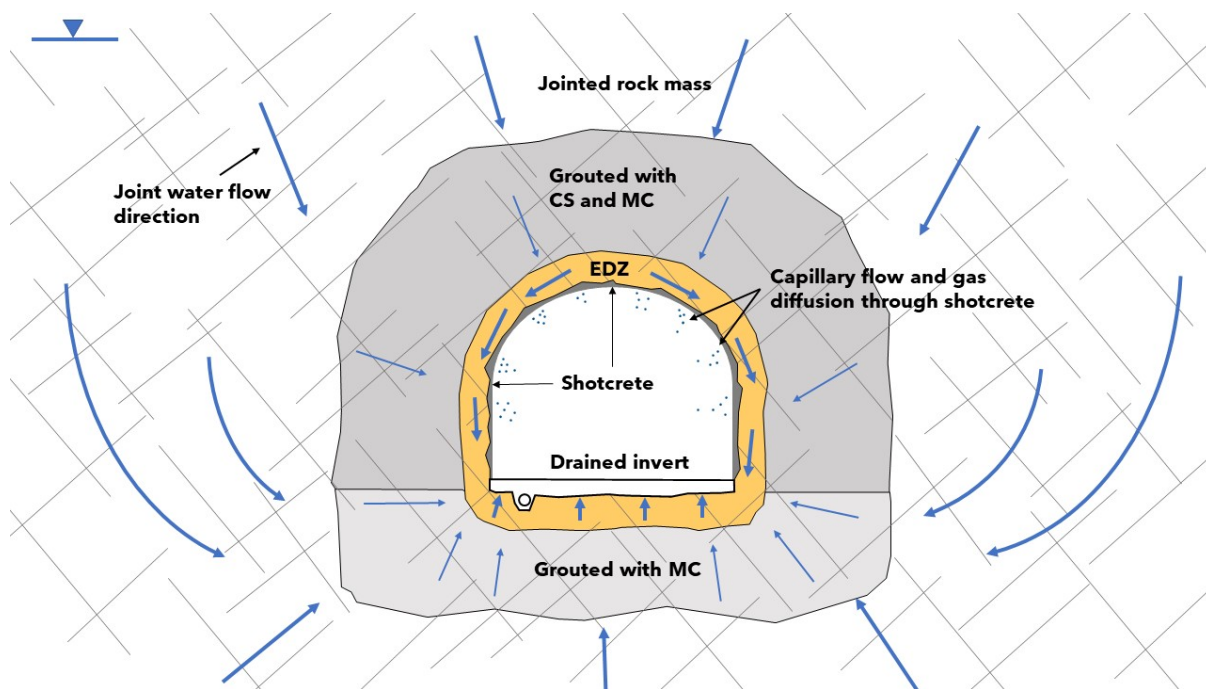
Concept of a functional dry tunnel, with a drained invert and a grouted zone around the tunnel. The invert is grouted with MC, and the walls and the crown are grouted with CS and MC. Shotcrete as part of rock reinforcement is planned to be a sufficient water barrier for the remaining inflow. Increased hydraulic transmissivity in the EDZ increases drainage towards the invert. The blue arrows show joint water flow; thickness indicates flow magnitude. CS = colloidal silica, MC = micro cement.
